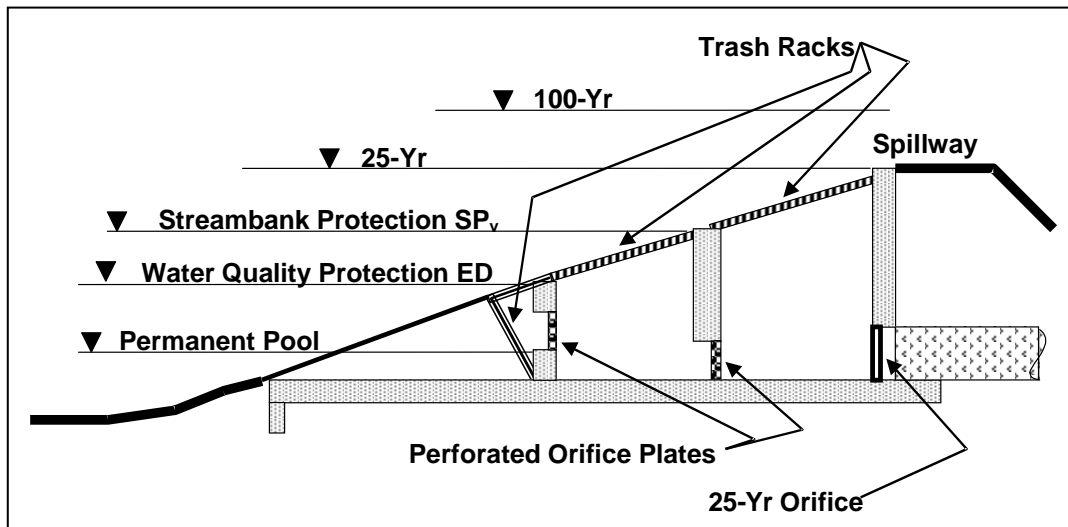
Schematic of Orifice Plate Outlet Structure
